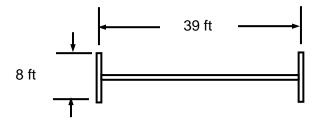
Cross-section of Tacoma Narrows Bridge Span
